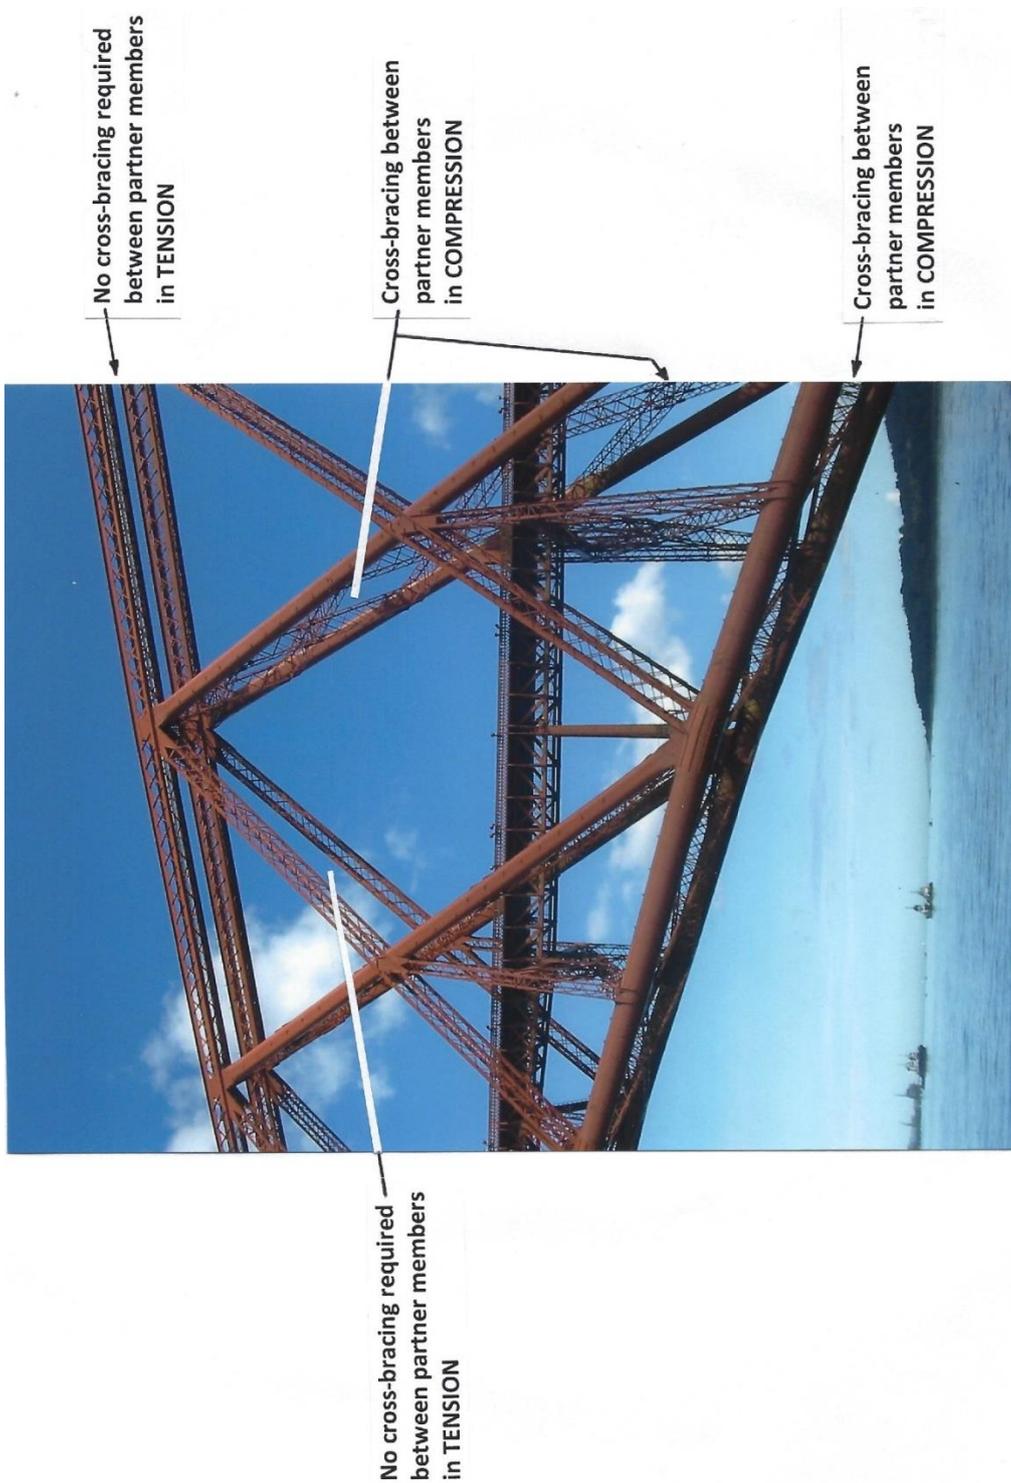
Cross-bracing provided between partner members in COMPRESSION to prevent buckling.
